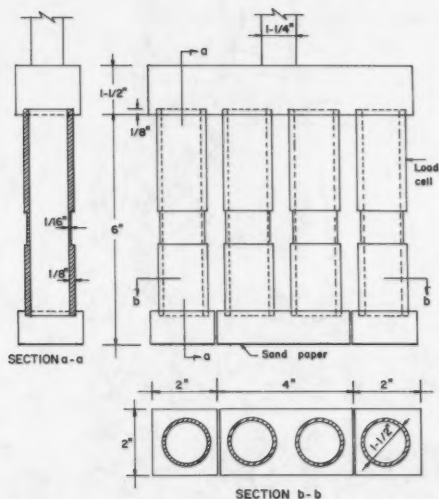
Instrumented Strip Footing Model (1 in. = 25.4 mm)
